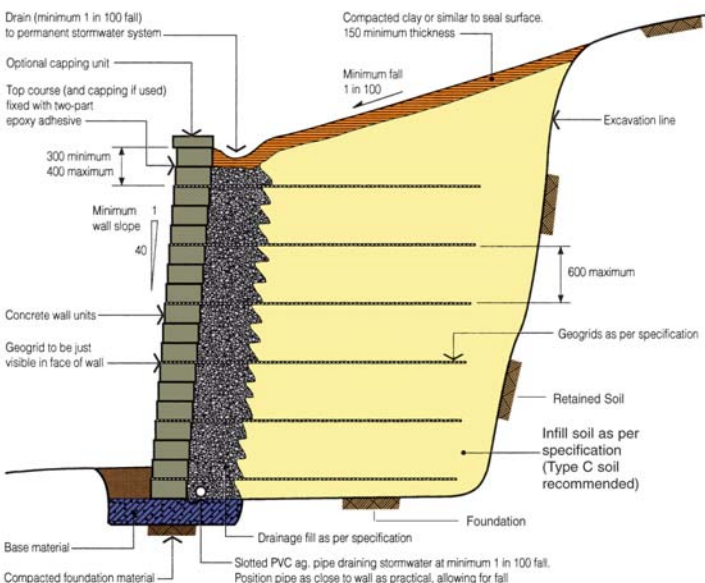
from HB156-2002 "Segmental Concrete Reinforced Soil Retaining Walls - Design and construction Guide" published by Concrete Masonry Association of Australia and Standards Australia - used with permission.
